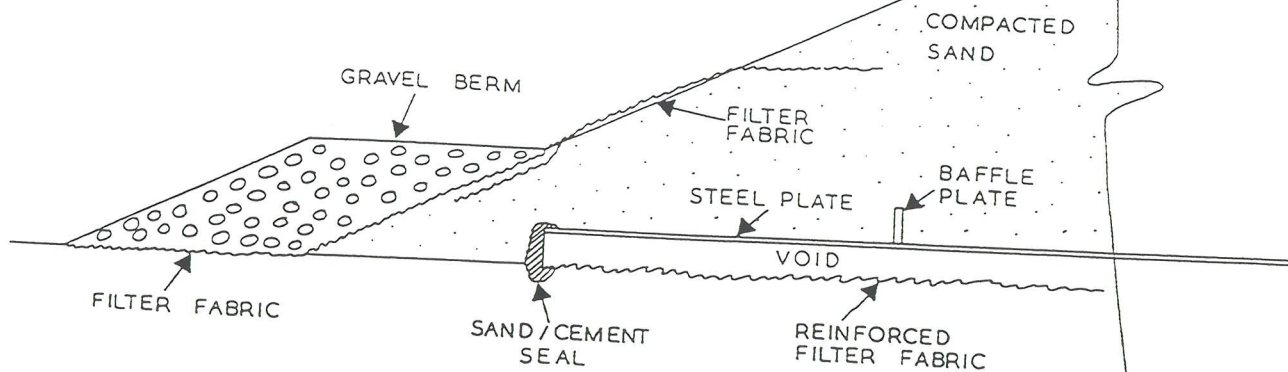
Sketch of measures used to stabilise sand around the void structure.
